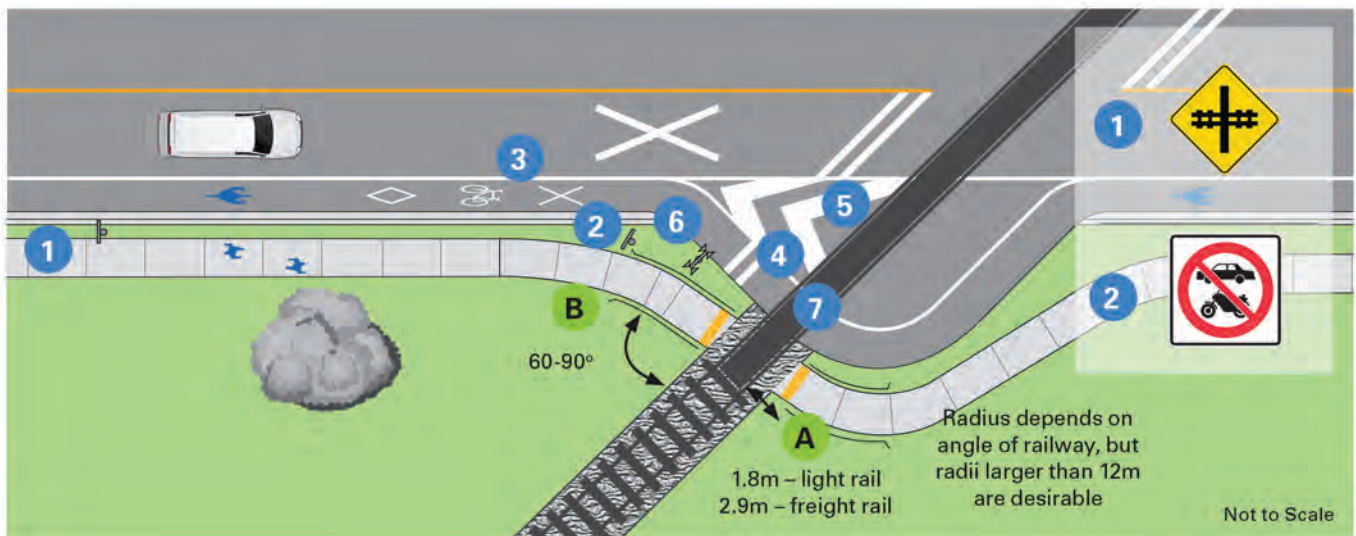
Jughandle Design for a Dedicated Bikeway with Sidewalk
